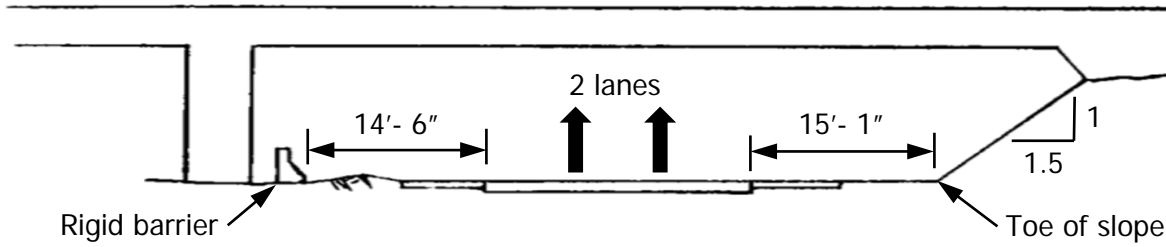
Bridge elevation view of horizontal clearances for a 2-lane, 1-way highway feature below the bridge, with a rigid barrier.
